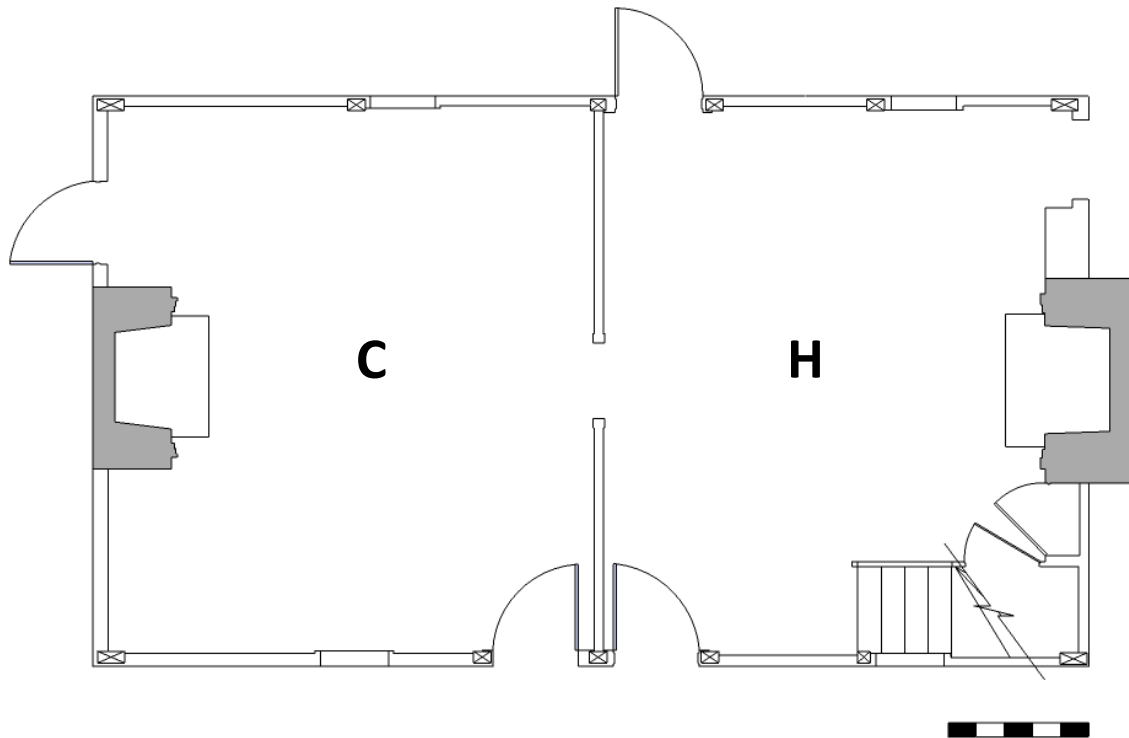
Ground-floor plan of the original 1769 section of Leatherbury Farm. The wall posts, plates, and joists are exposed on the interior and have chamfered edges with lamb's tongue stops. Scars in the joists and plates indicate the building originally had two brick ends with exterior chimneys. The brick ends were removed sometime in the early nineteenth century. Drawing by author.
